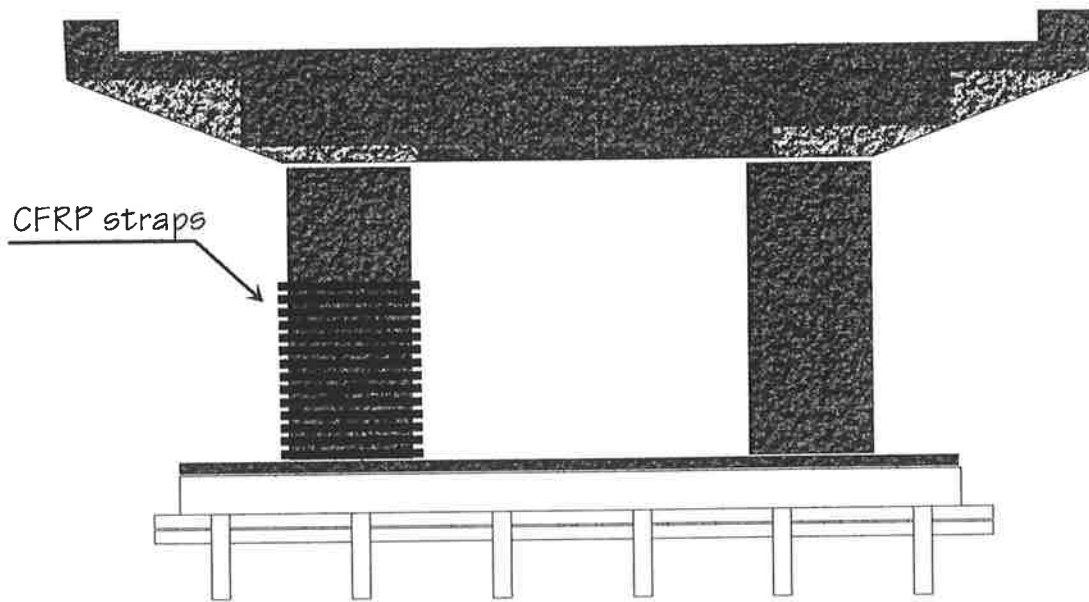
Retrofitted and unretrofitted concrete bridge columns.
